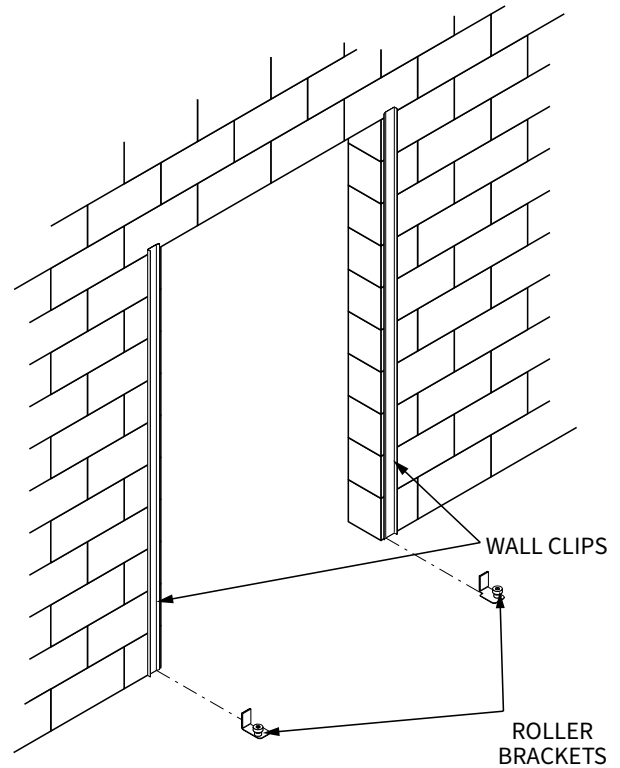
installing wall clips and roller brackets (Bottom roller brackets not present for leading edge on doors with breakout egress option).
